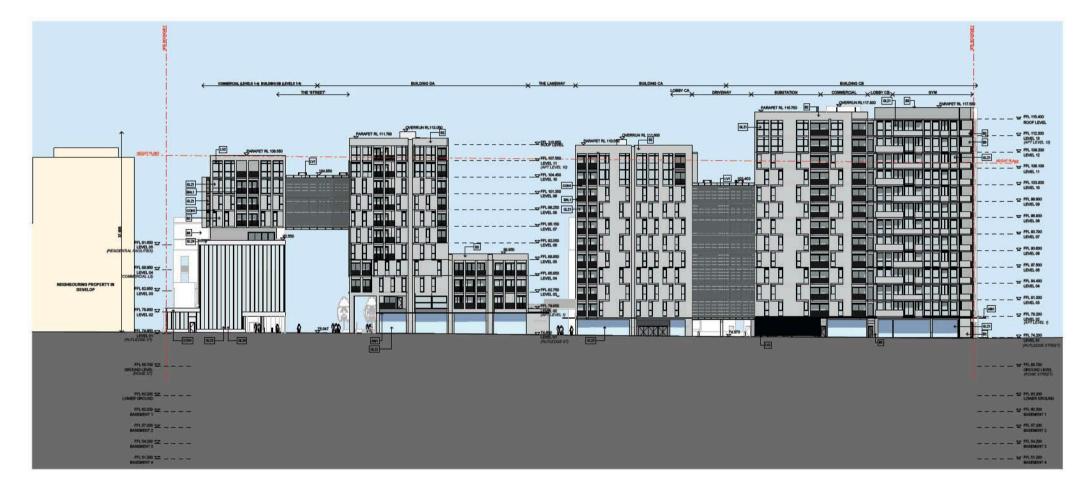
Rutledge Street elevation (Source: HDR Rice Daubney, drawing No. 1501, Rev 01, dated 12/07/16)
